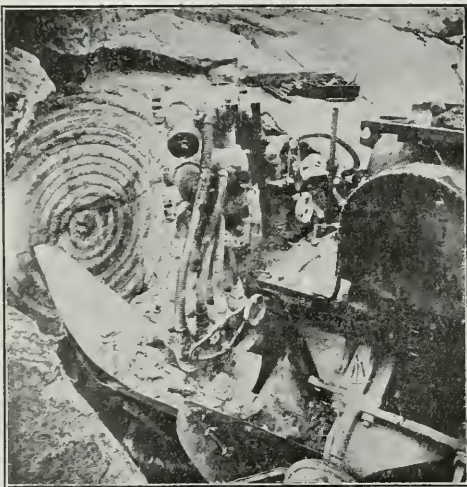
Showing Face of Bore Made by Tunneling Machine.
